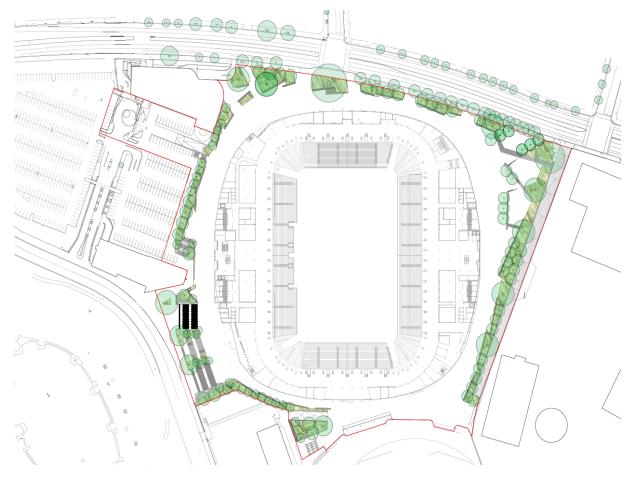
Site layout and public domain plan (source: Cox Architecture and ASPECT Studios)
